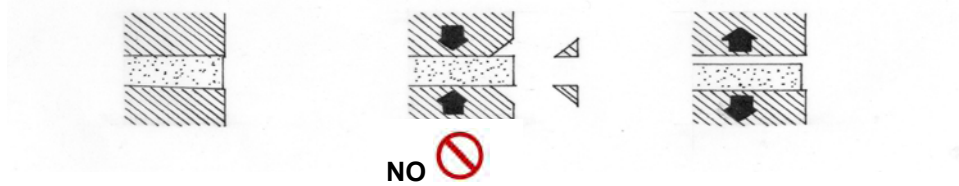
Hard mortars can cause spalling and cracking.
